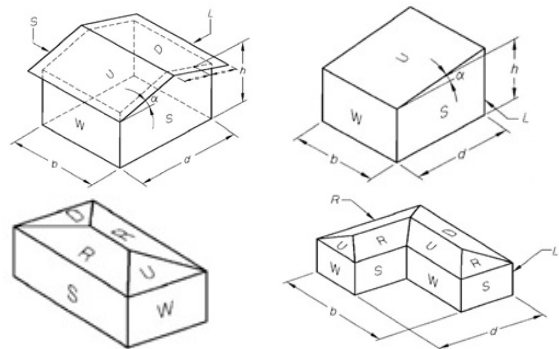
Examples of Common Roof Geometries (from AS/NZS 1170.2)
